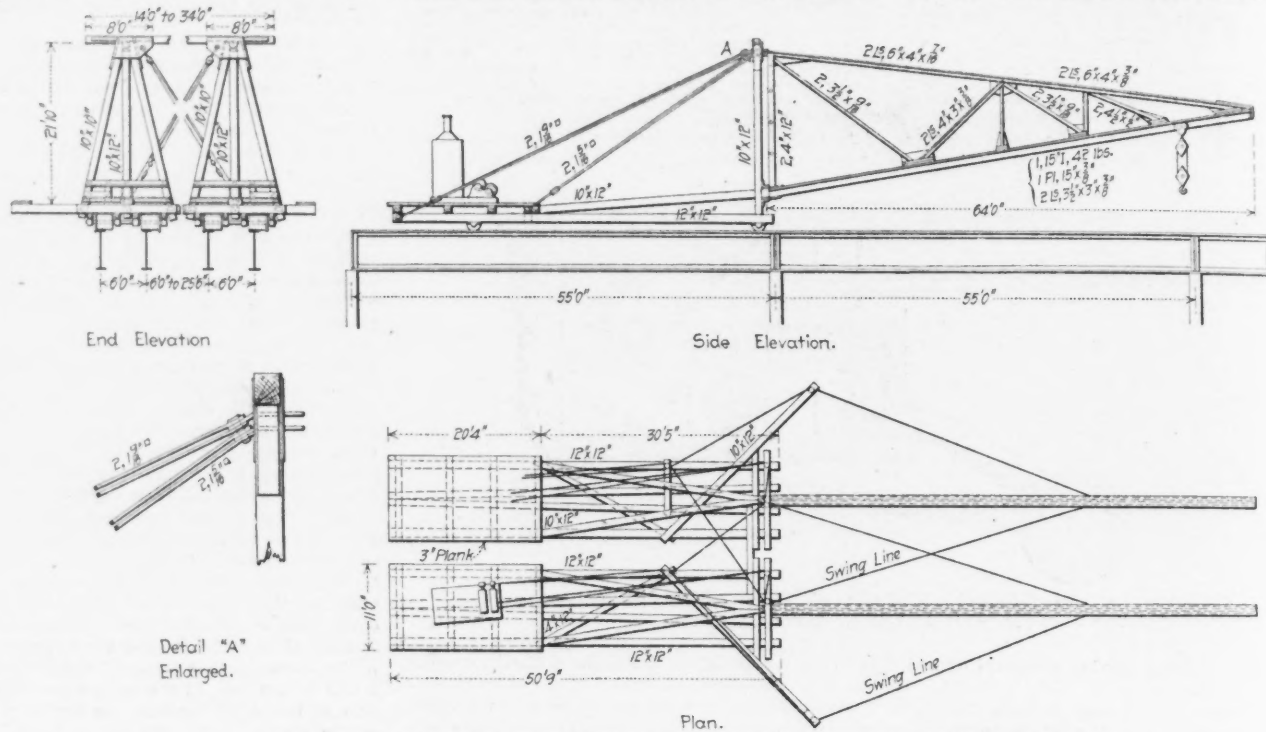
PLAN AND ELEVATIONS OF TRAVELER FOR ERECTING BOSTON ELEVATED RAILWAY.
